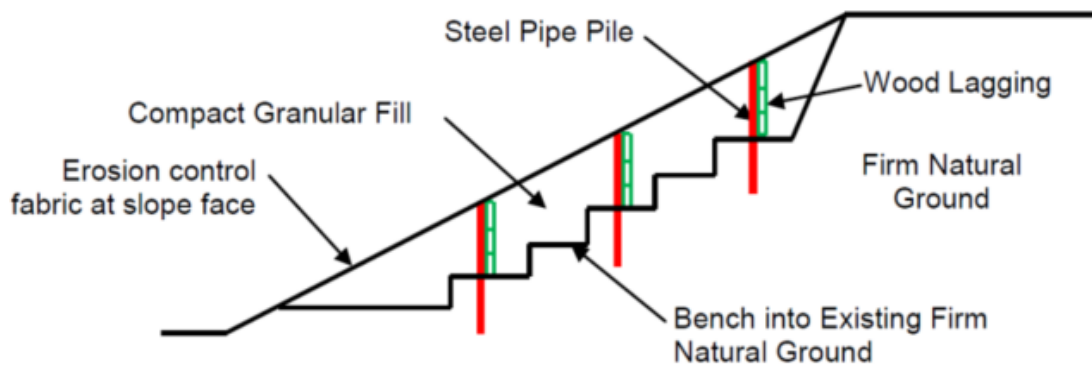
Graphical representation of pipe piles and wood lagging system (Day, 1996).
